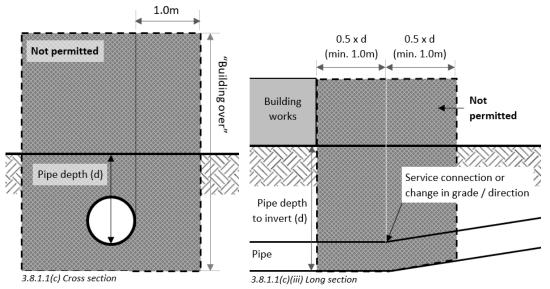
Restrictions for building over service connections, changes in grade/direction
